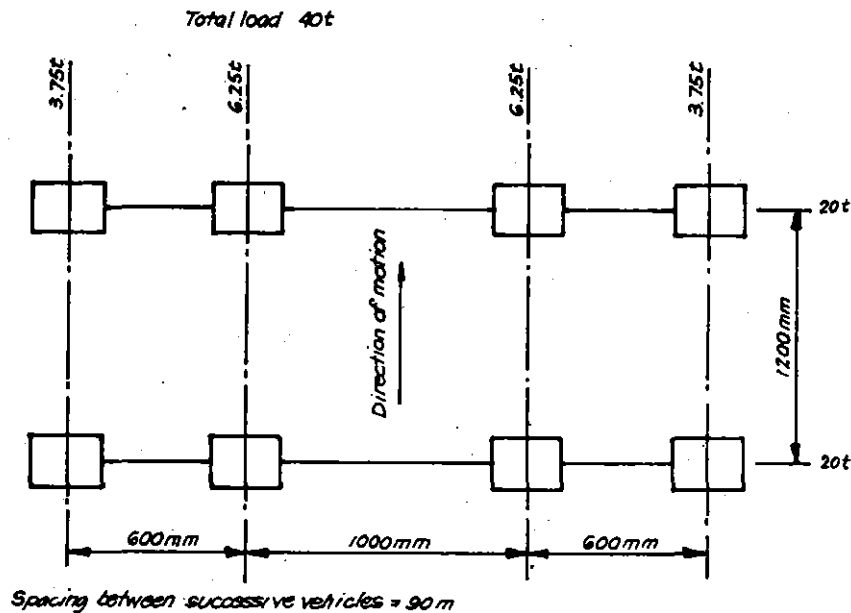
Plan view of the class AA 'Wheeled' vehicle
